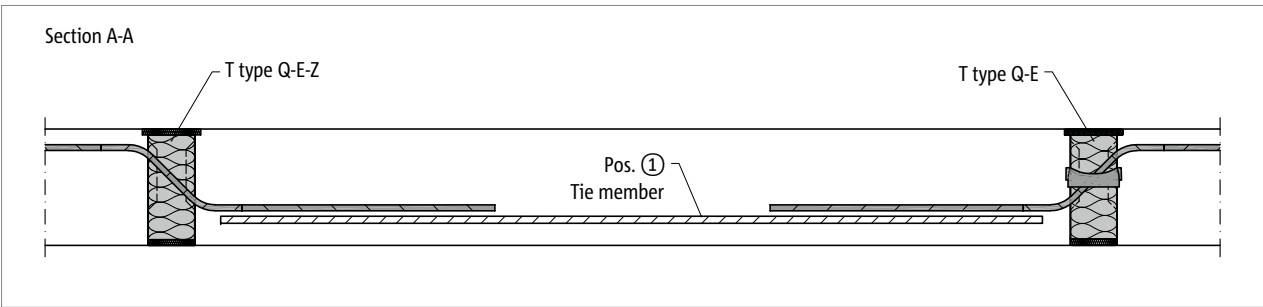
Schöck Isokorb® T type Q-E, Q-E-Z: Section A-A; one-way reinforced concrete slab
